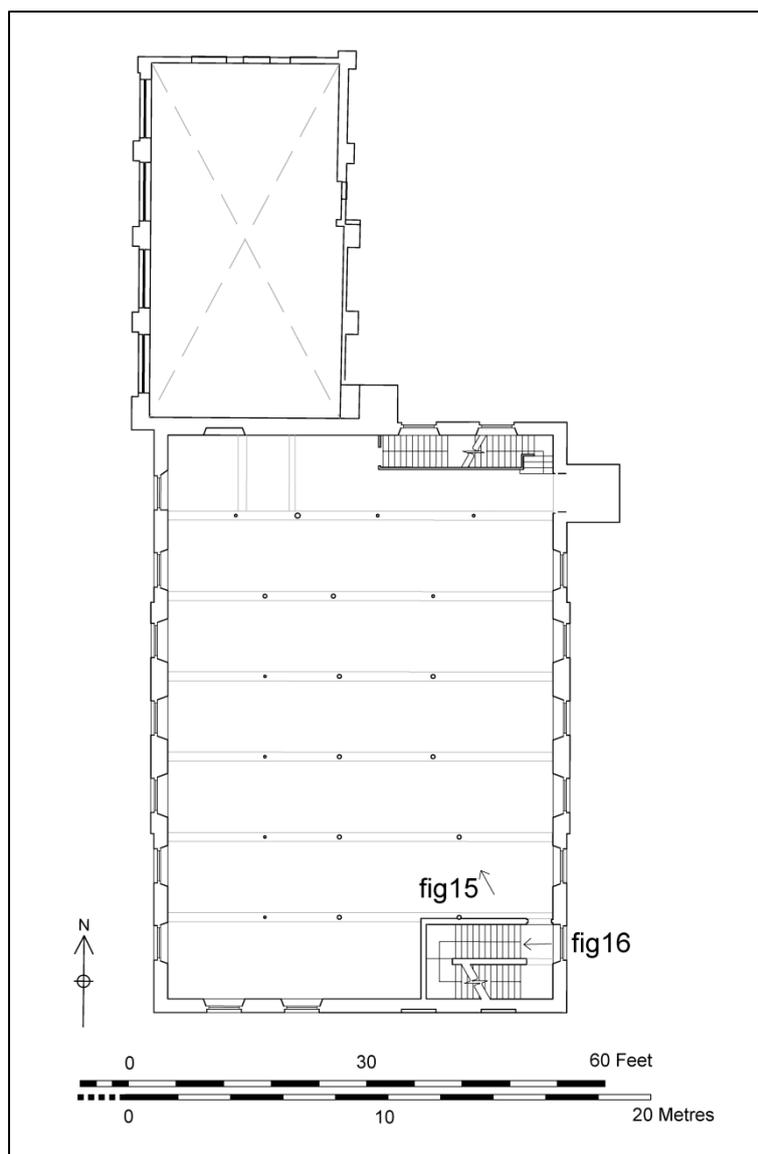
Location of selected photographs (figs 15-16) on first floor plan of Friars Mill (plan produced by Greenhatch Architects).
